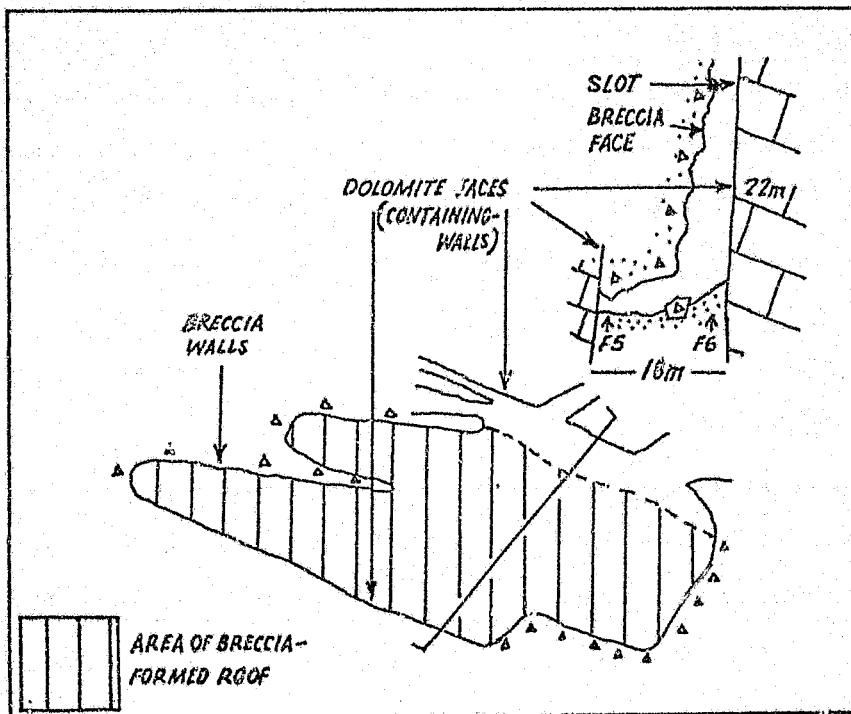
Plan of Terror Chamber showing area of breccia-formed roof and position of vertical dolomite containing walls
